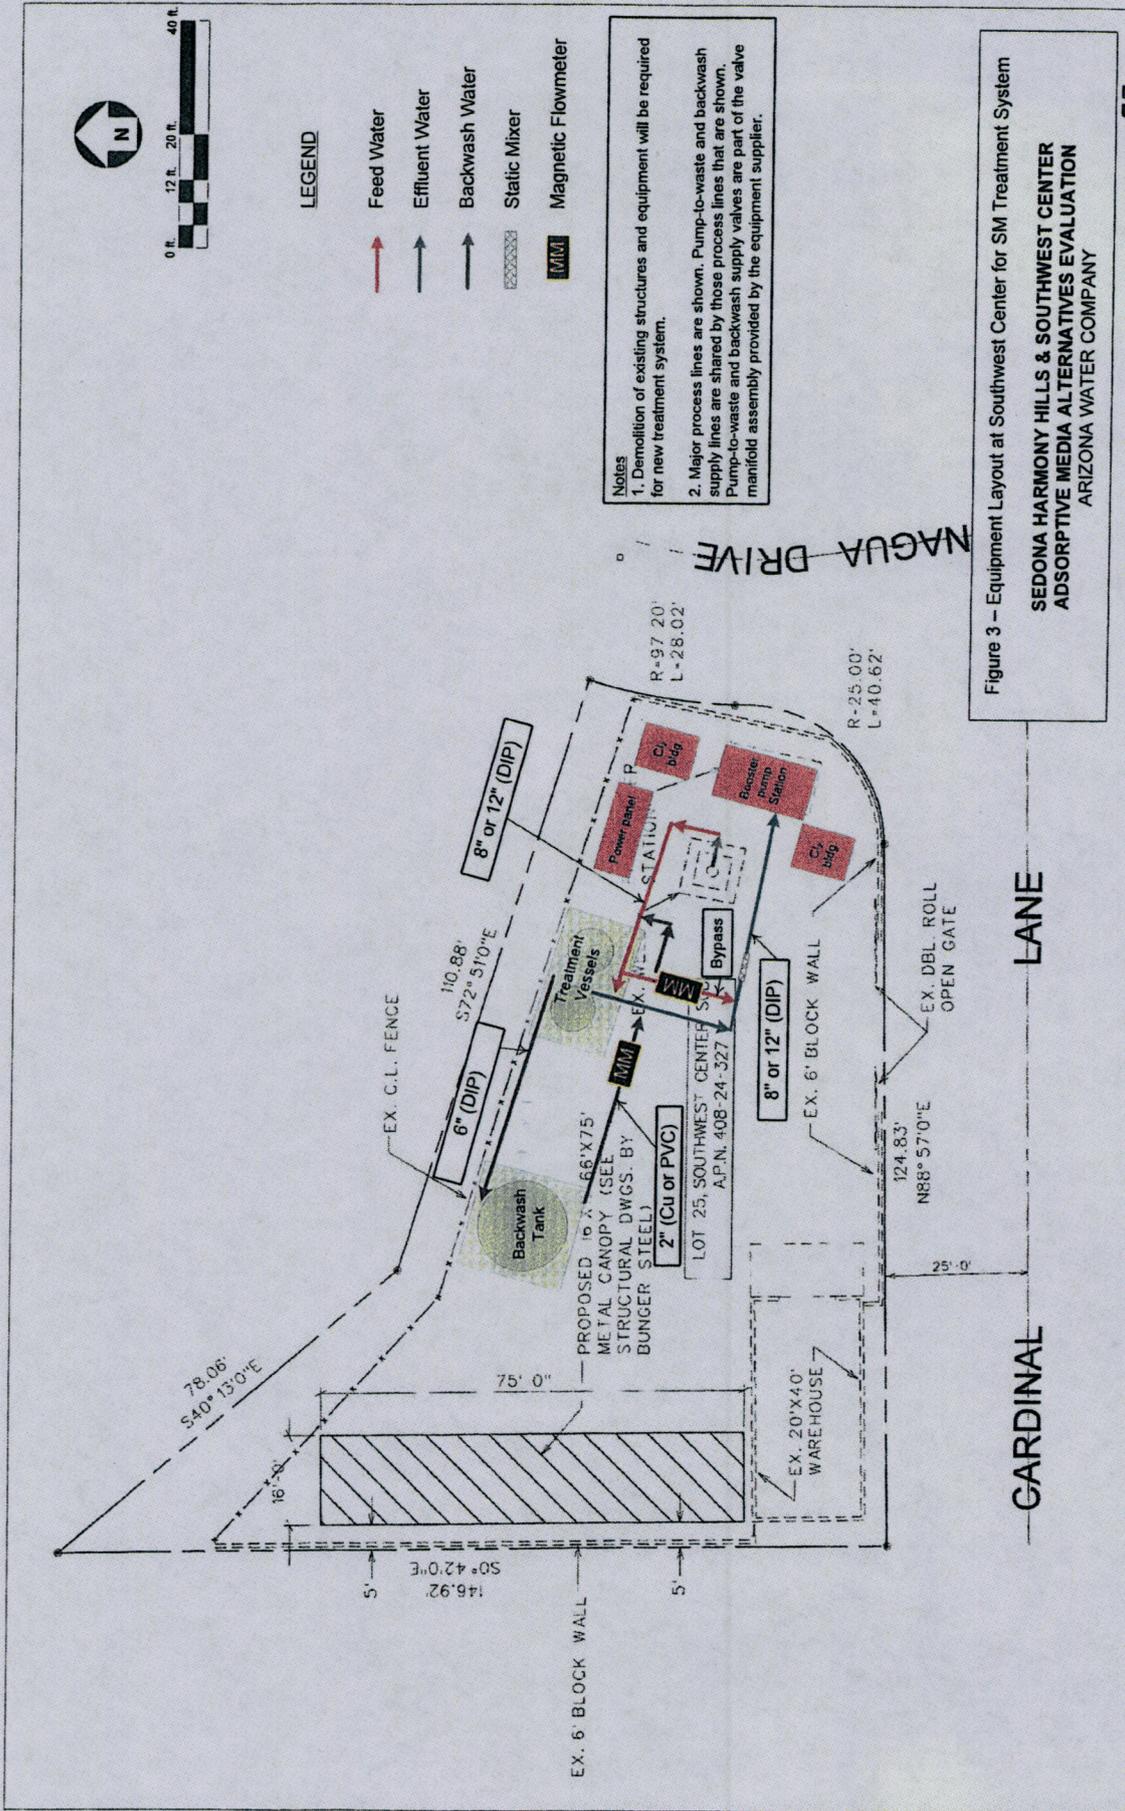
Equipment Layout at Southwest Center for SM Treatment System
